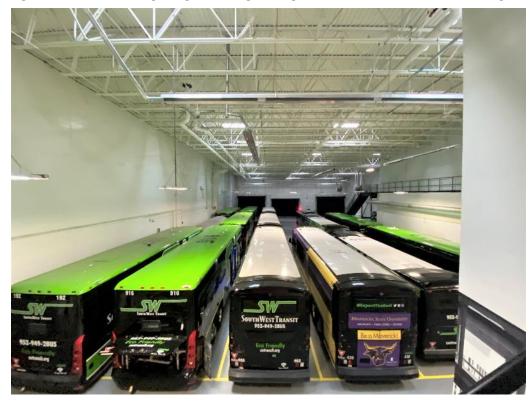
View into Parking Garage B with High Ceiling & Mezzanine and Access Stair to the Right
